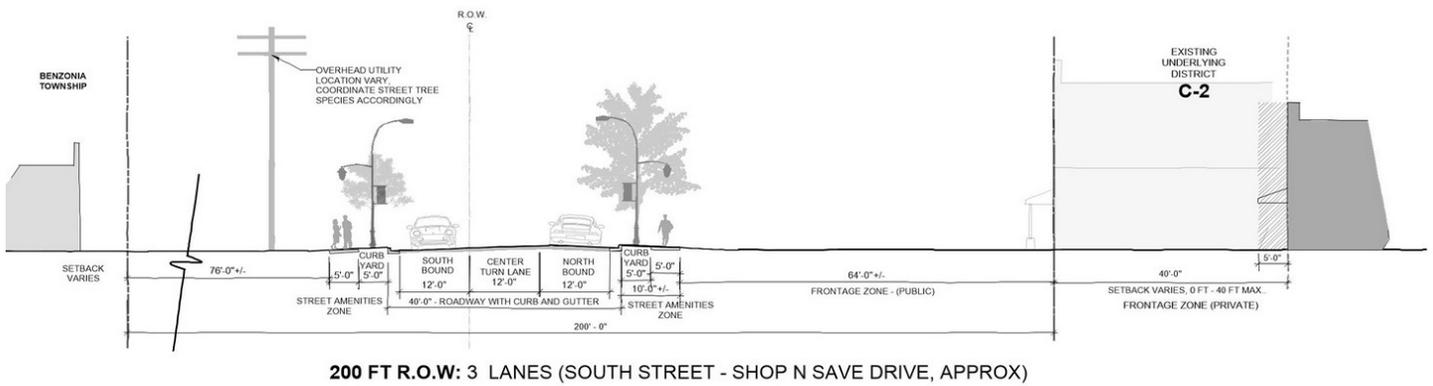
COD-G: Typical Cross Section - Future Streetscape Elements Showing Wide Right-of-Ways
